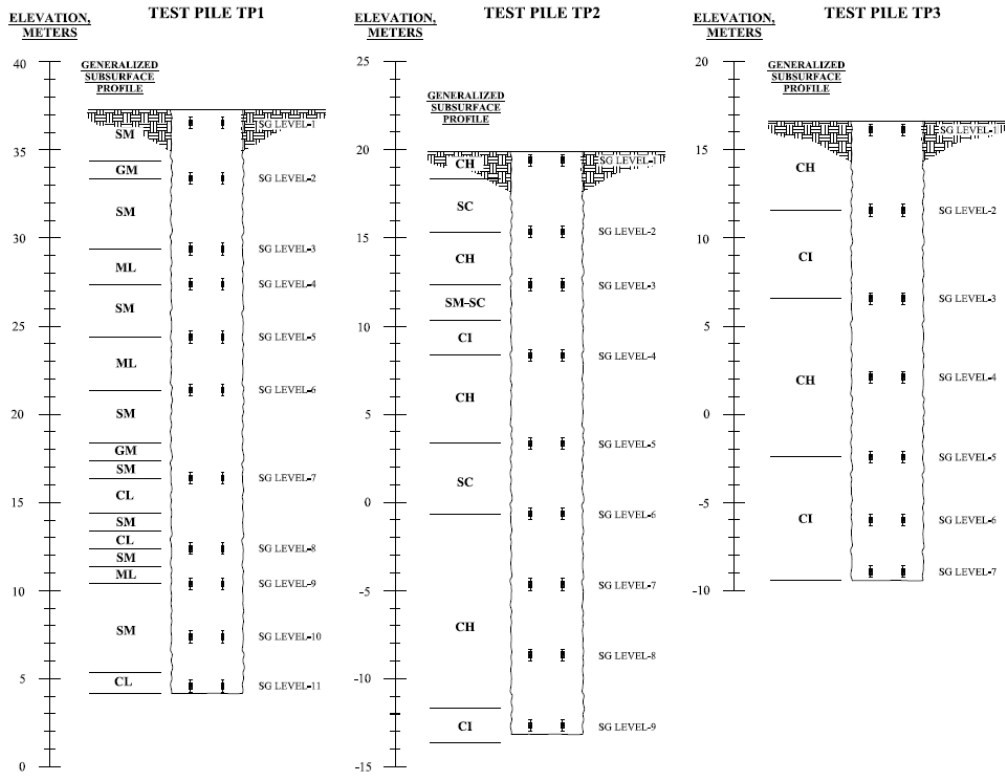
Pile elevation views and instrumentation layout for Project 1
